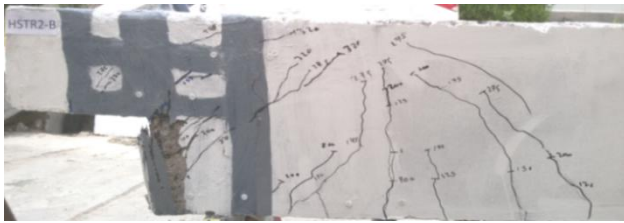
Cracks patterns for strengthening beams HSTR2-B
